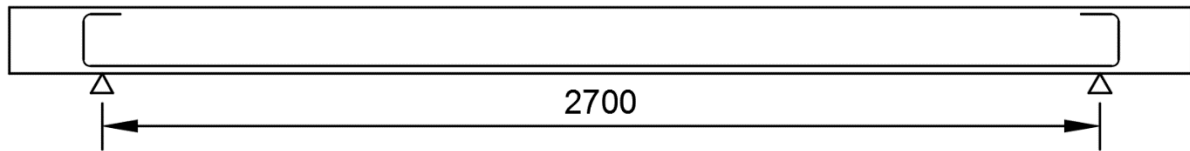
Reinforcement bar layout of the reinforced and combined beams.
